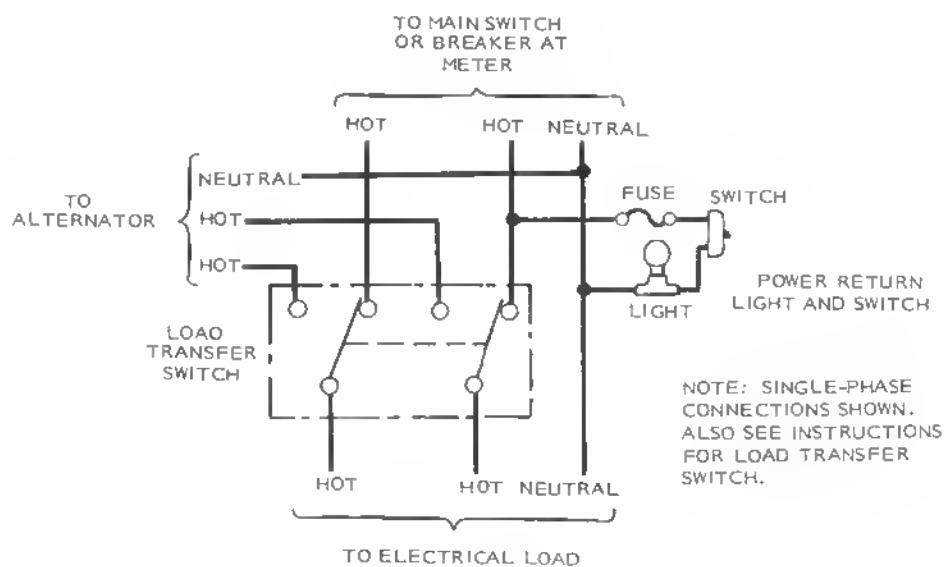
LOAD TRANSFER SWITCH CONNECTIONS
